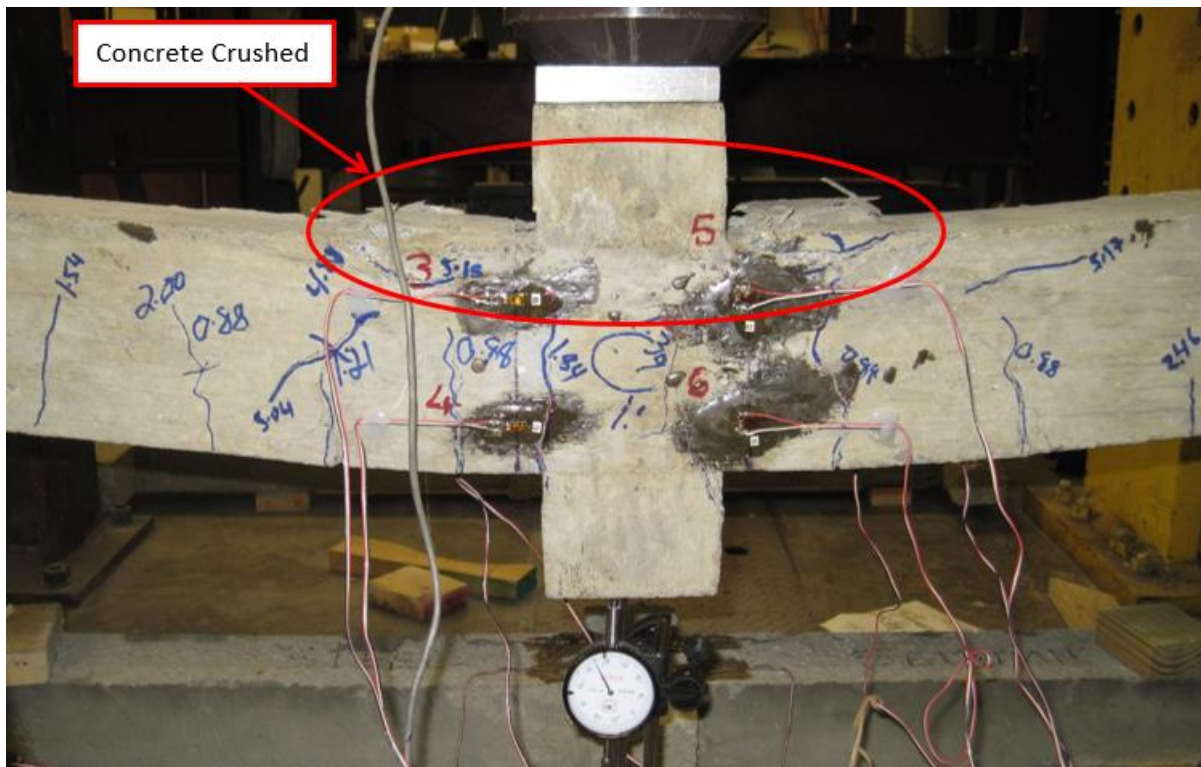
Missing Column Crack Pattern at the Collapsed Load for Specimen B2-2
